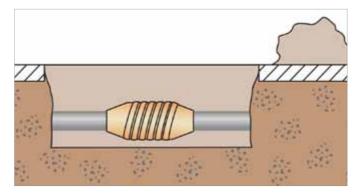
Installation of RAUTITAN system below ground with fittings wrapped with corrosion protection system
